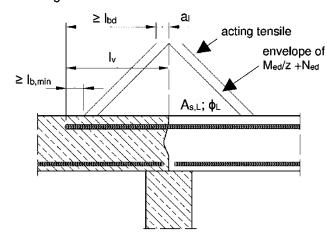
Overlapping joint at a foundation of a wall or column where the rebars are stressed in tension
